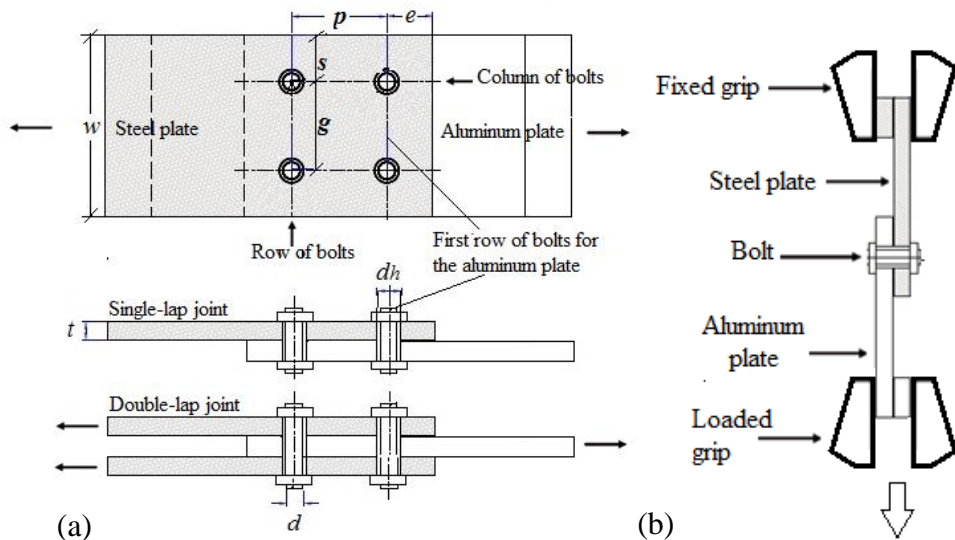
(a) Typical bolted joint in single-lap and double-lap arrangements, (b) Test set-up of aluminum to steel connection
